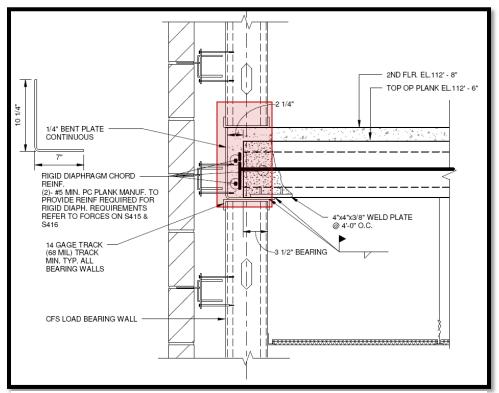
Slab Perimeter Detail – Courtesy of Barton Malow
